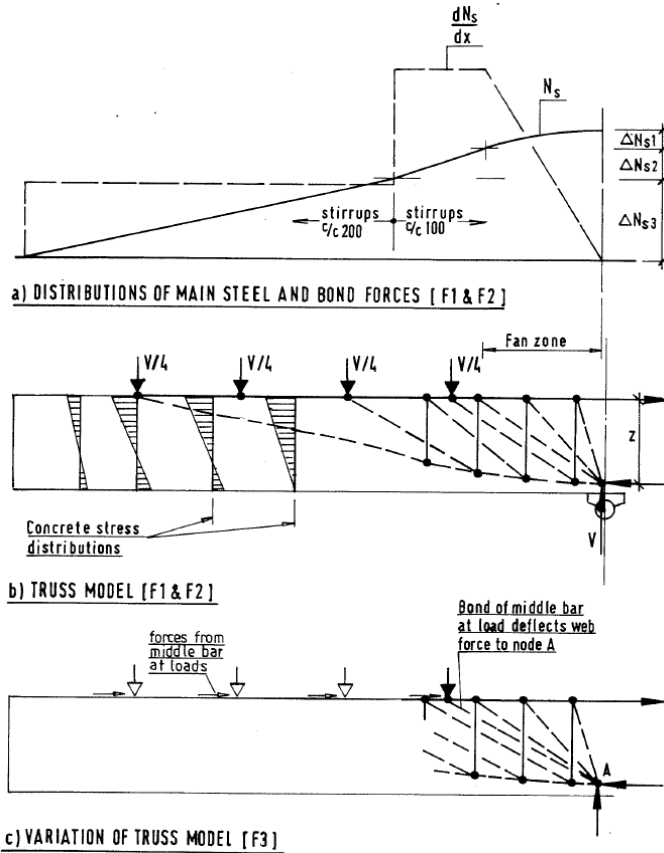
Distributions of main steel and bond forces in Beams F1 and F2 (a); and truss models (b, c).
